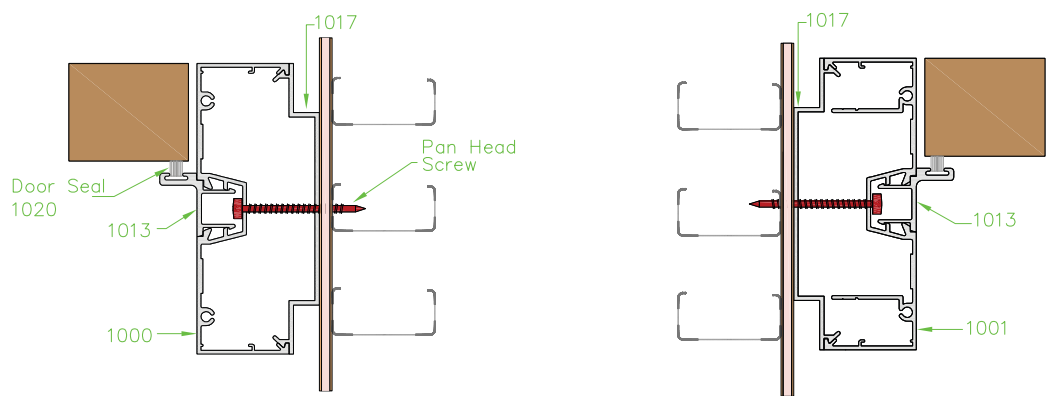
| Vertical Section Drawing of SM64 Shadowmax Detail at Ceiling
